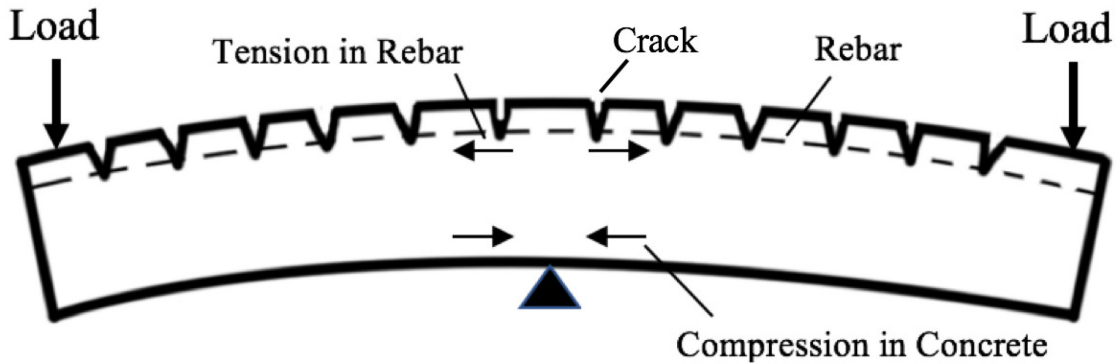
Due to the high tensile stresses applied on the top of the beam, reinforcing the concrete with steel at the upper half prevents crack propagation through the beam at failure reproduced from [2]
